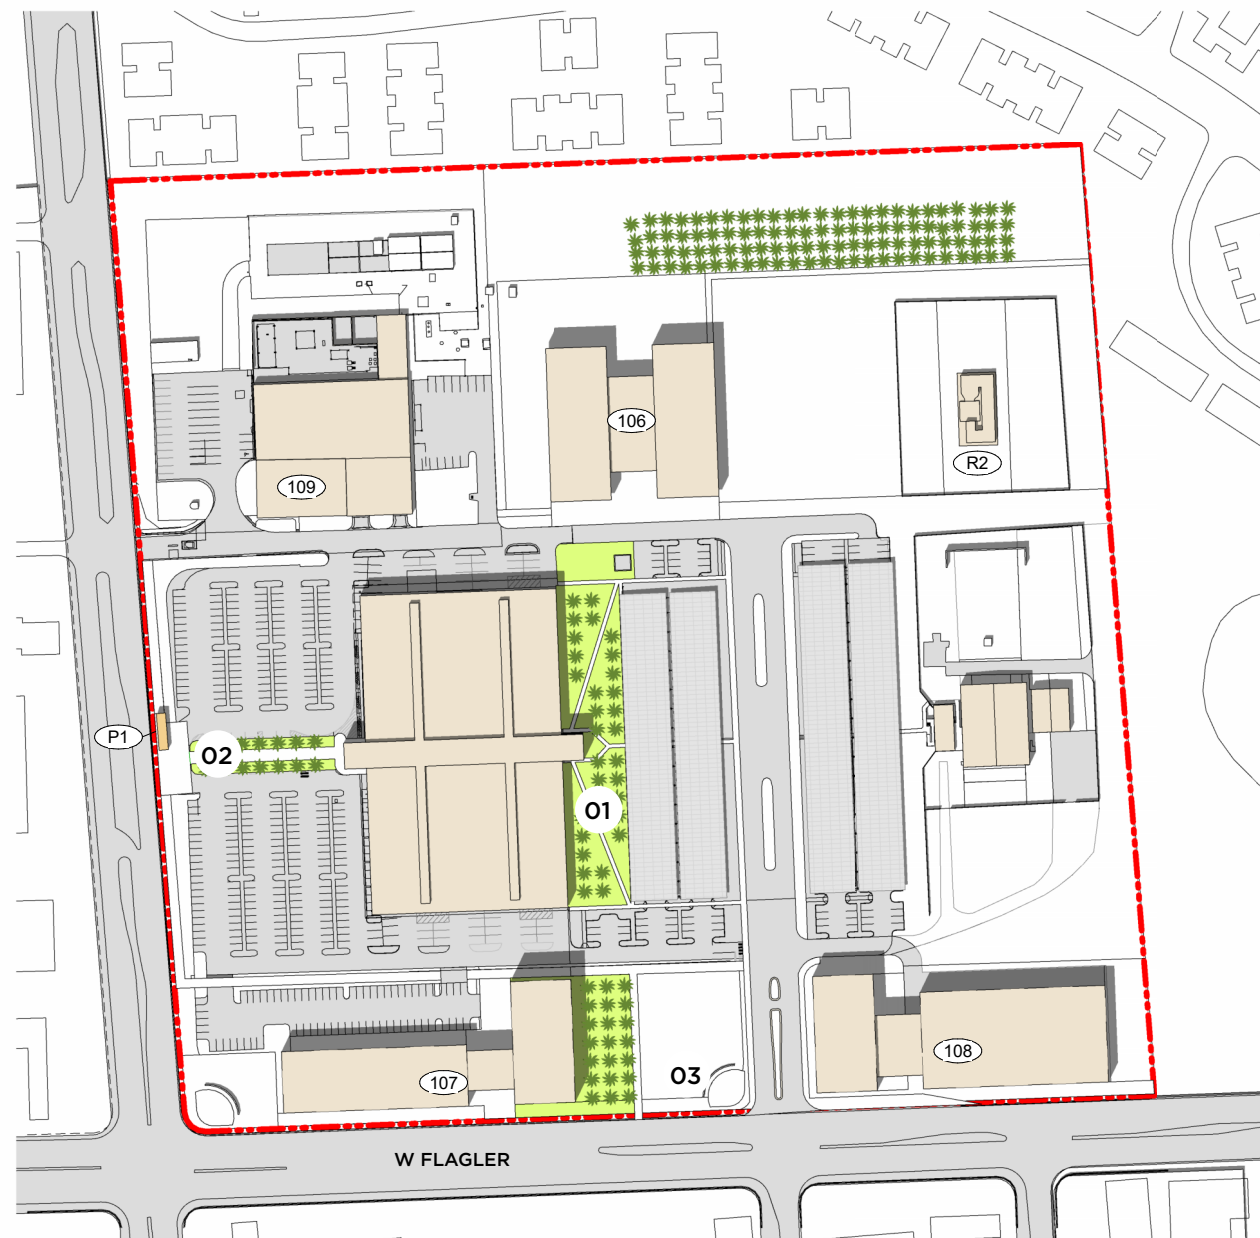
EC 2035 PLAN - CONSERVATION
